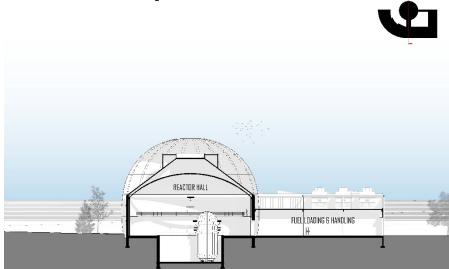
A building section of the nuclear power plant, showing how the veil structure wraps the reactor hall. (Source: Author)
